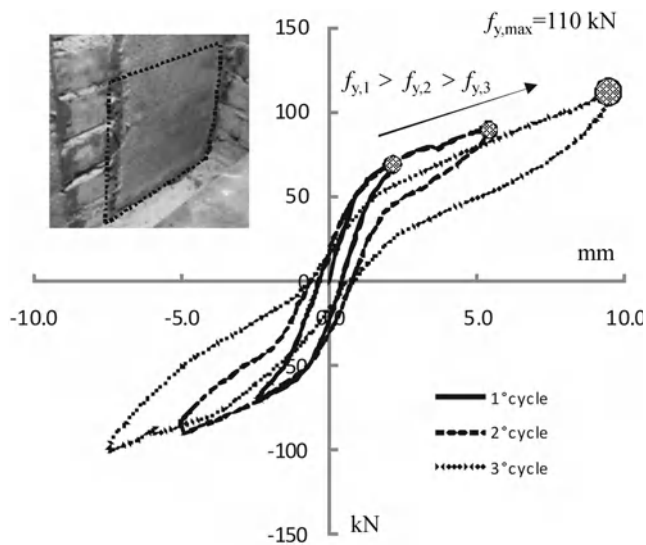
Cyclic behavior of the strengthened wall: at top left a detail of collapse due of crushing the masonry
